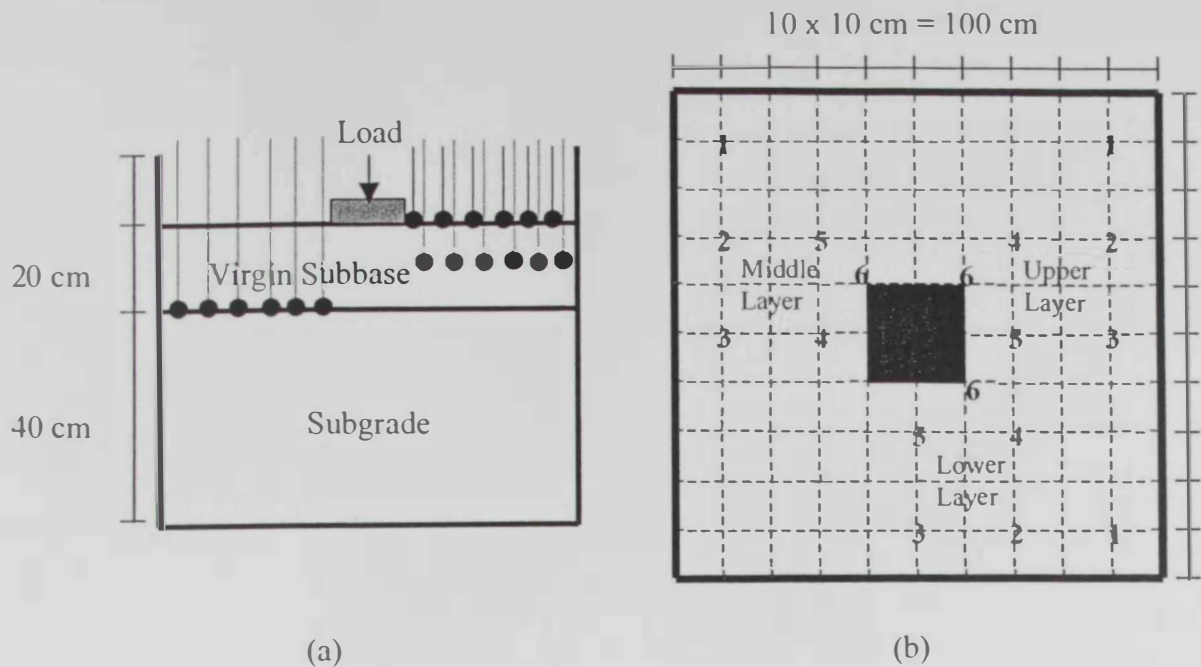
Model Description- Experimental Setting III: (a) Side View for the Layer Thicknesses and Material Types, (b) Top view of the Gauges Location
